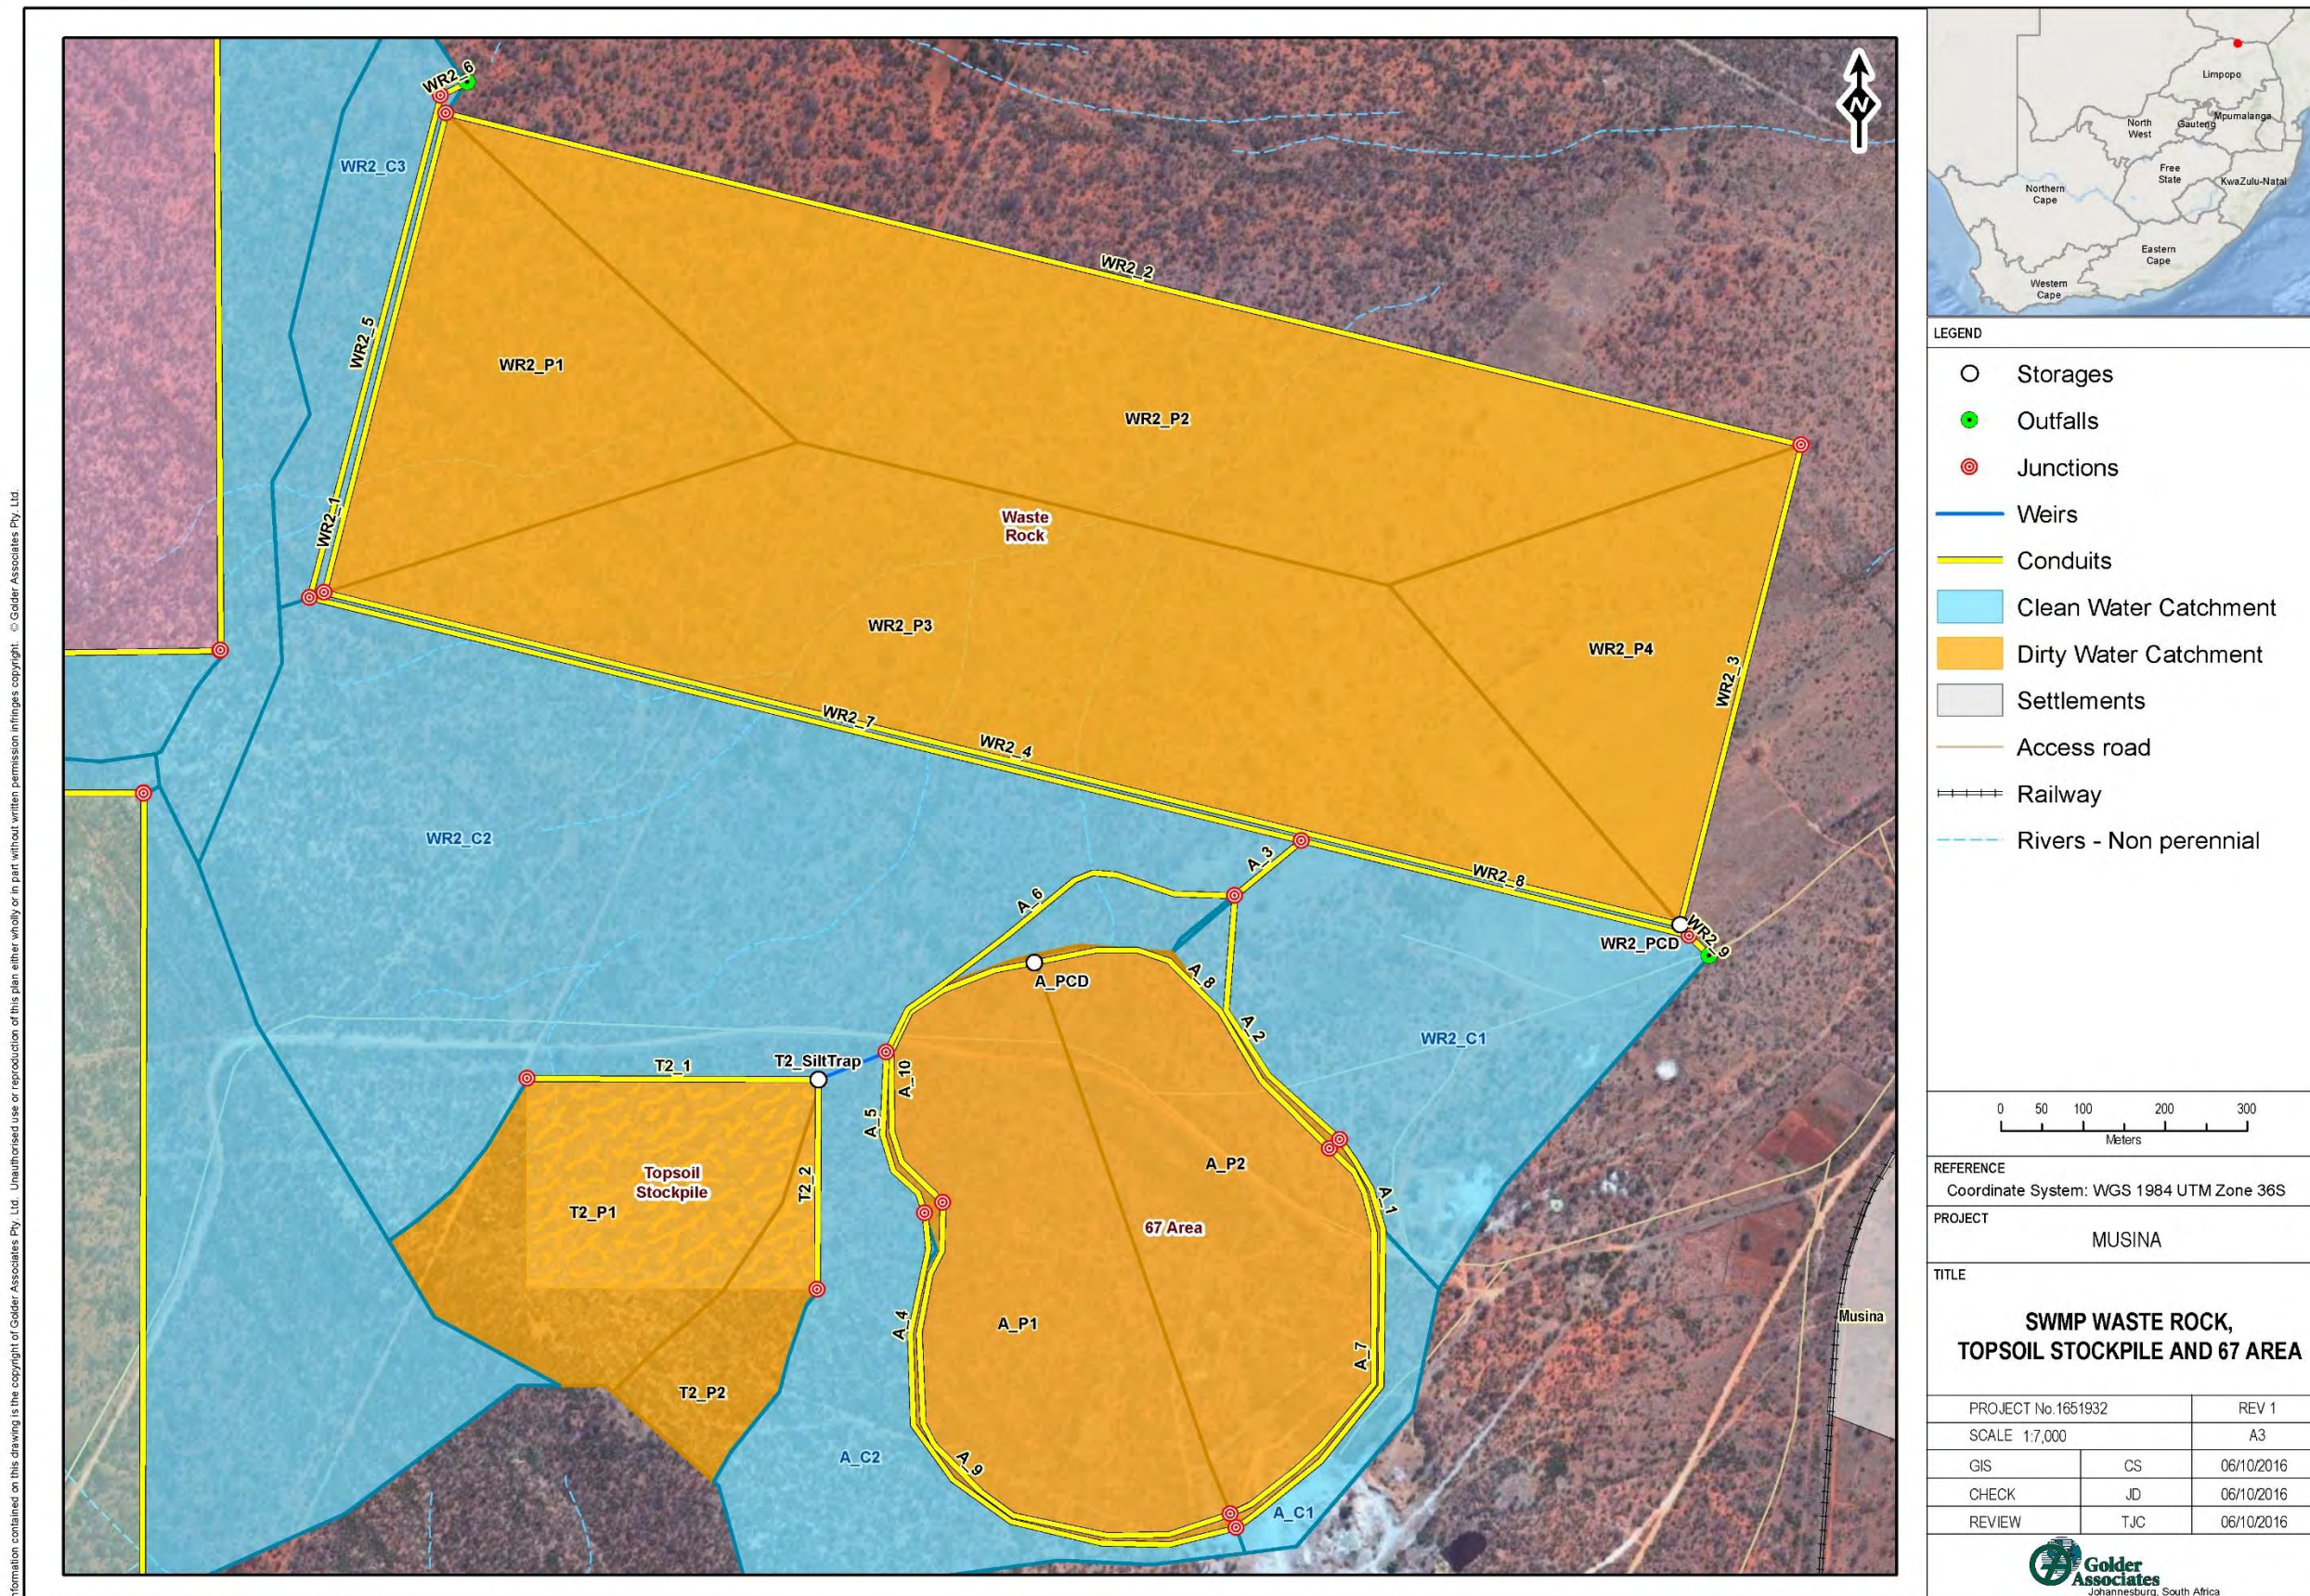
Eastern Waste Rock and topsoil stockpile stormwater management plan
